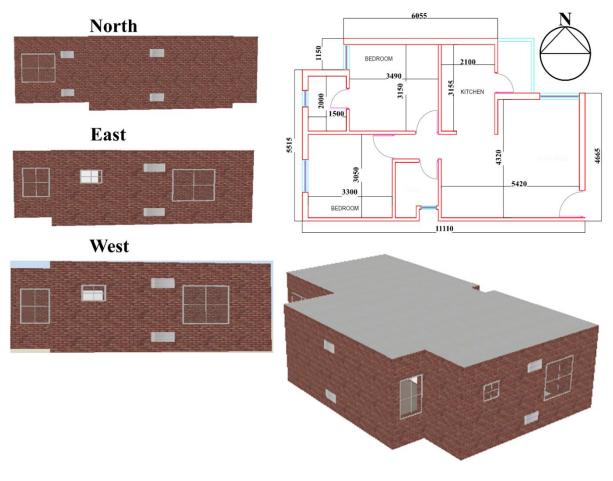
Floor plan for a 2-bedroom apartment, Case 1. Dimensions are in mm. The 3D shows the location of the windows/dampers for the 2-bedroom apartment.
